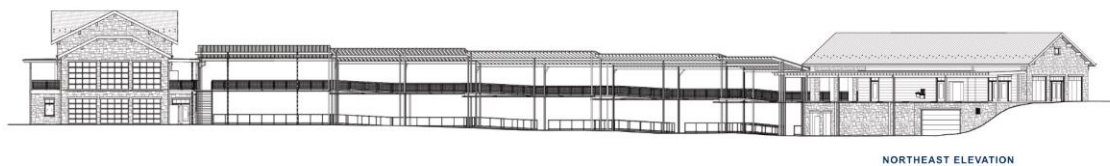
Alternative 2: Proposed clubhouse (left), driving range (center), and cart barn (right), northeast elevation.
